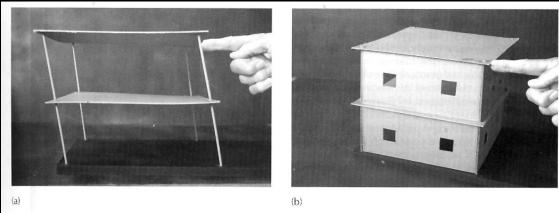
(a, b) Structural frame stabilized by adding shear panels.
